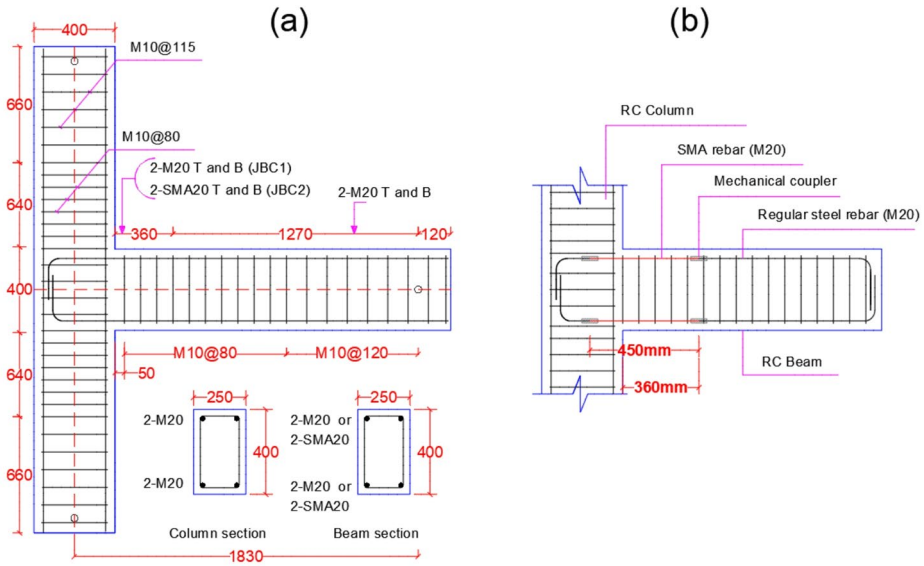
(a) Geometry and reinforcement details of JBC1 and JBC2, (b) Splice details of specimen JBC2 (Youssef et al. 2008)
